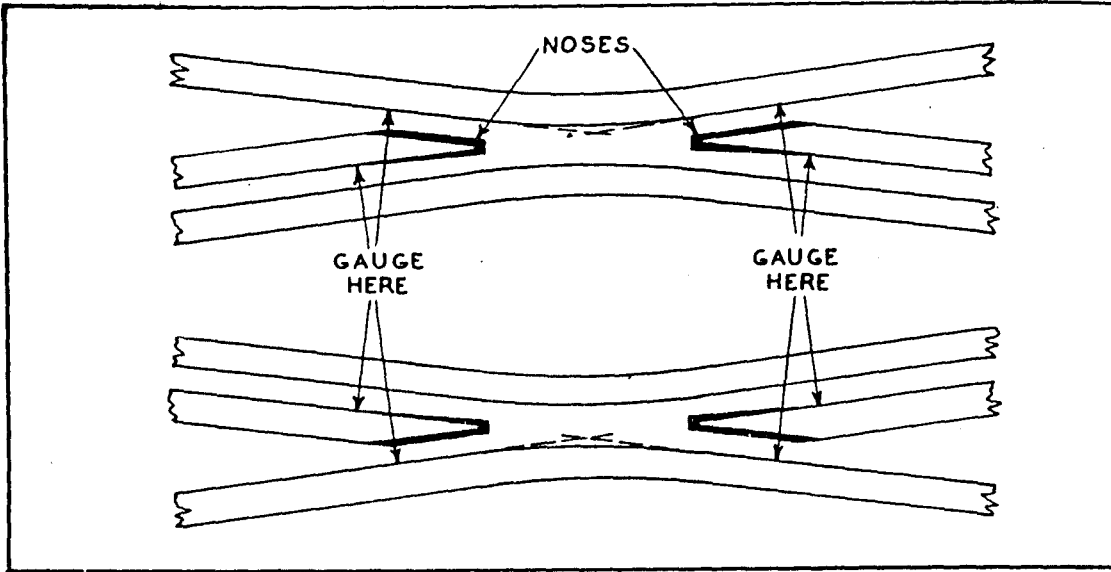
K CROSSINGS SHOWING POSITIONS OF GAUGING
